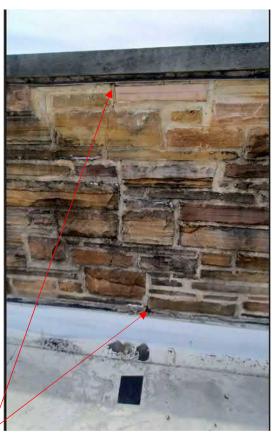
Areas of cracked and broken limestone in need of repair, tuckpointing and cleaning.
